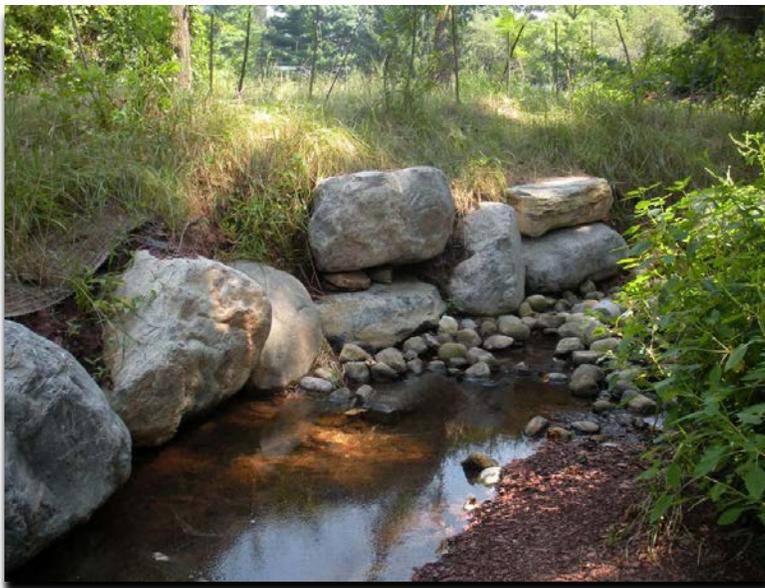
Boulder Toe Protection. Source: Princeton Hydro
